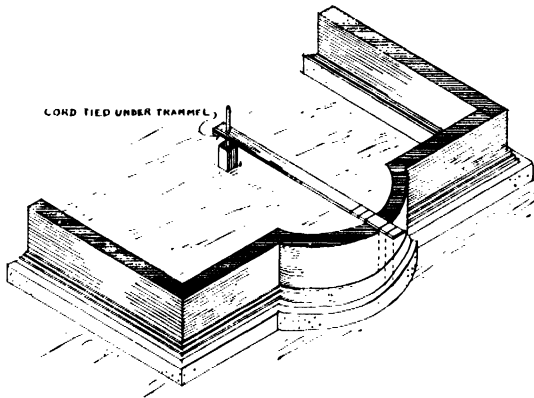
BUILDING CIRCULAR BAY WITH TRAMMEL
